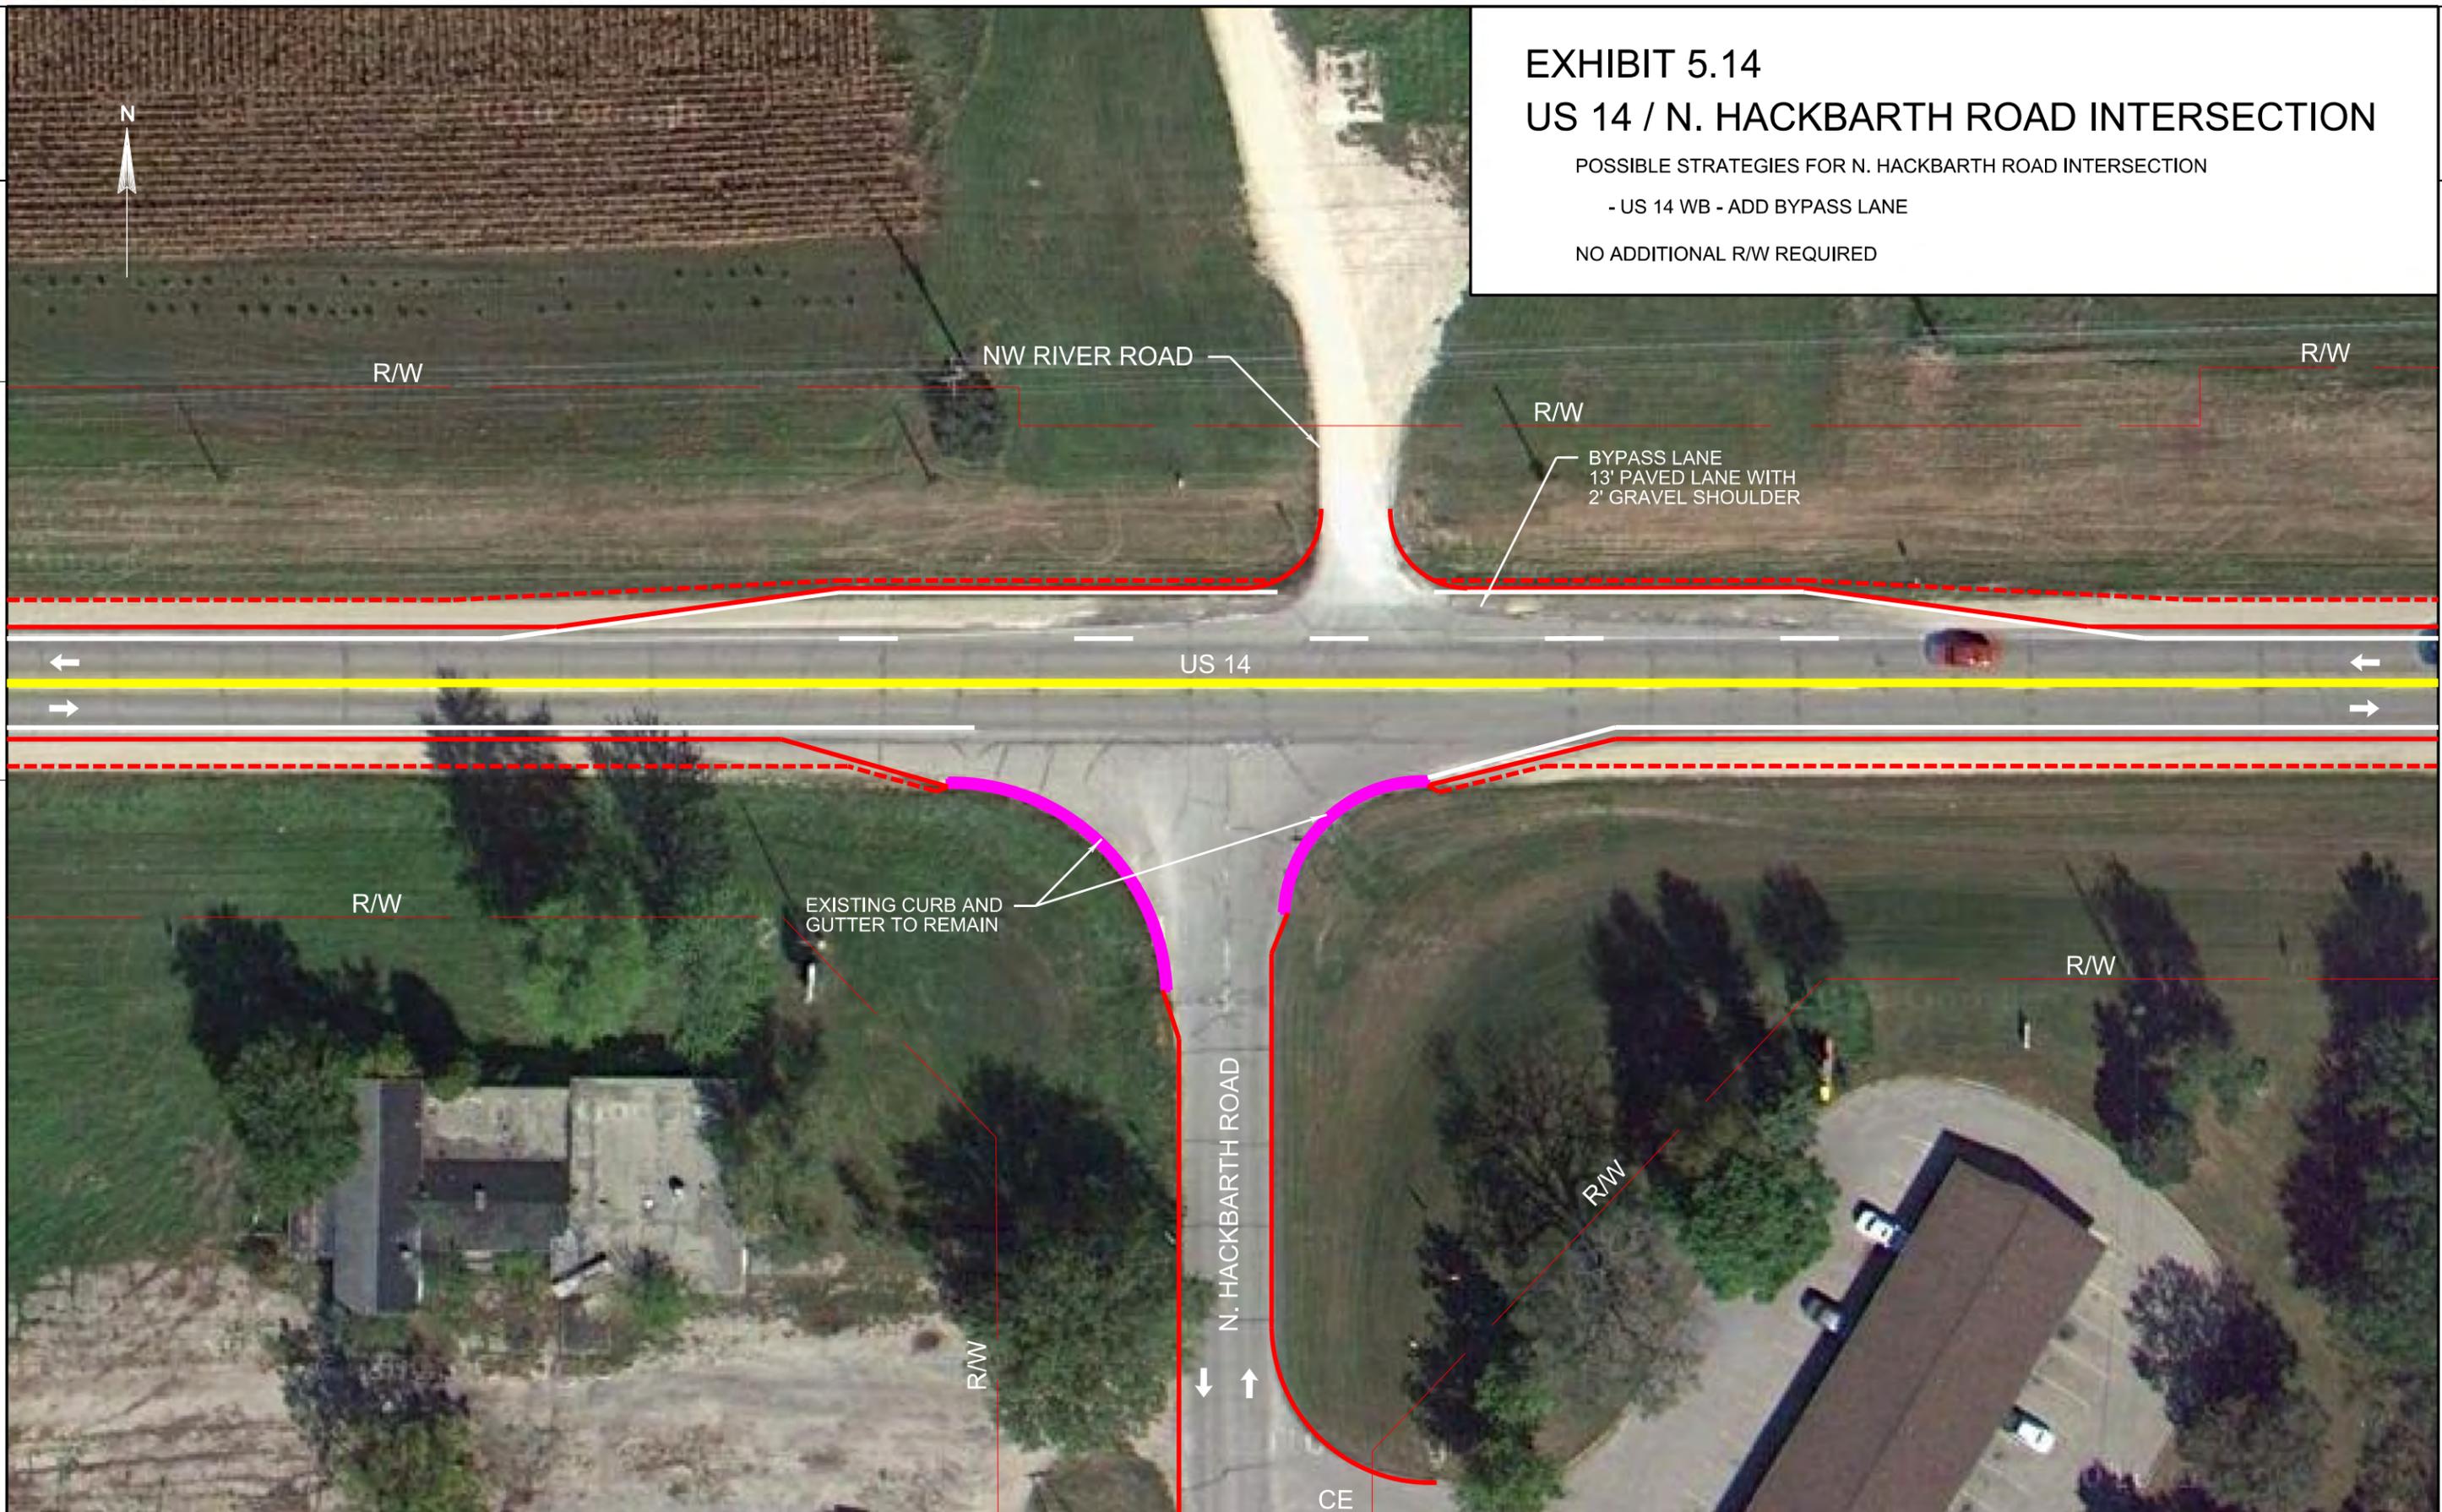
US 14 / N. HACKBARTH ROAD INTERSECTION
